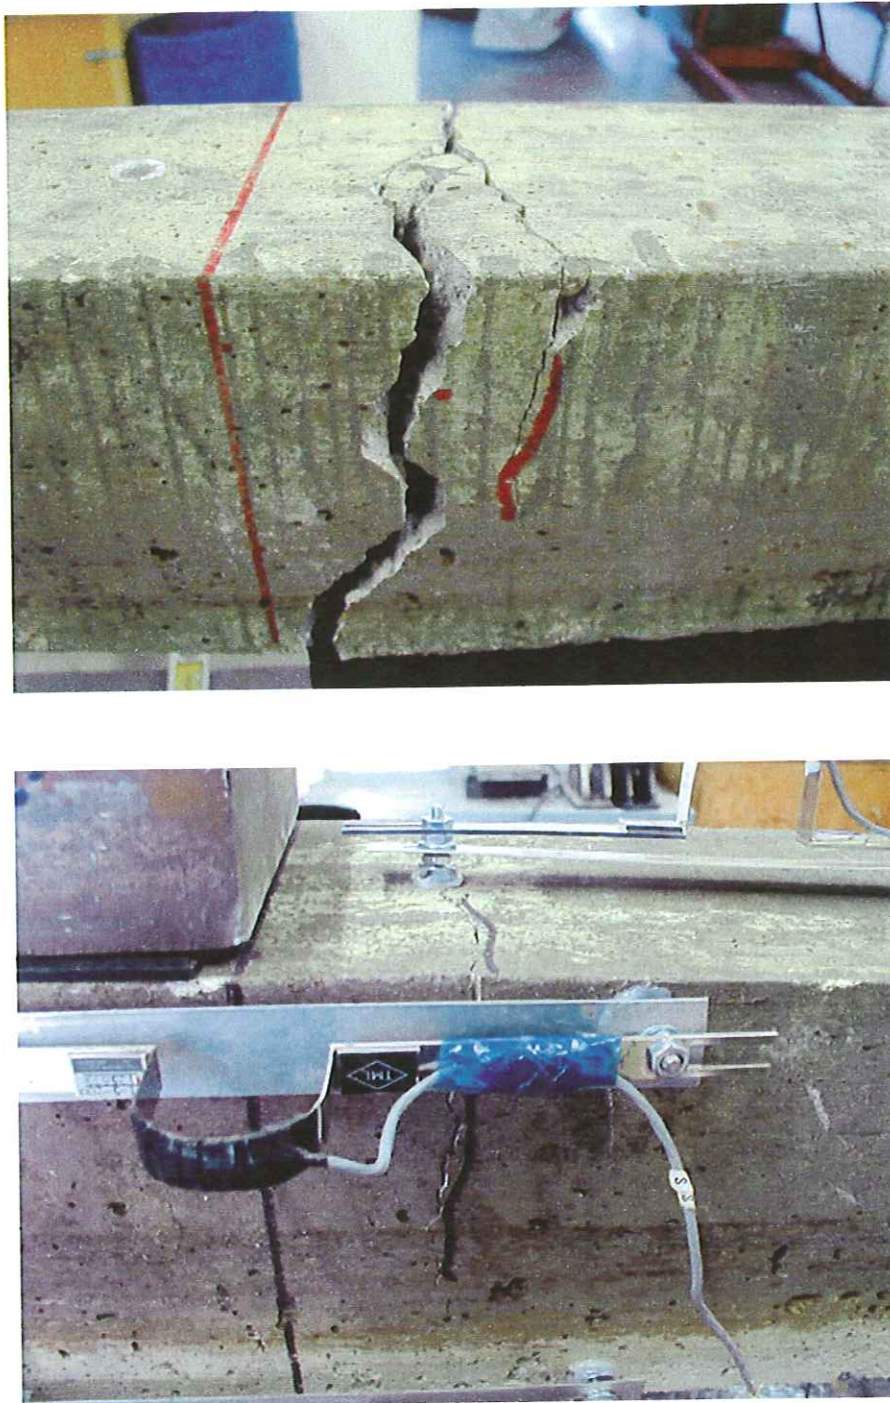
Typical failure of the concrete beams reinforced with steel.
